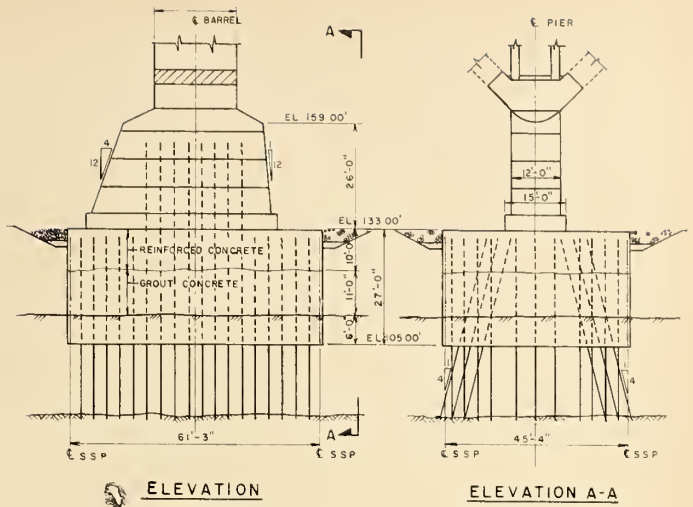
Extra Strong Pier (Piers 2 and 4).
